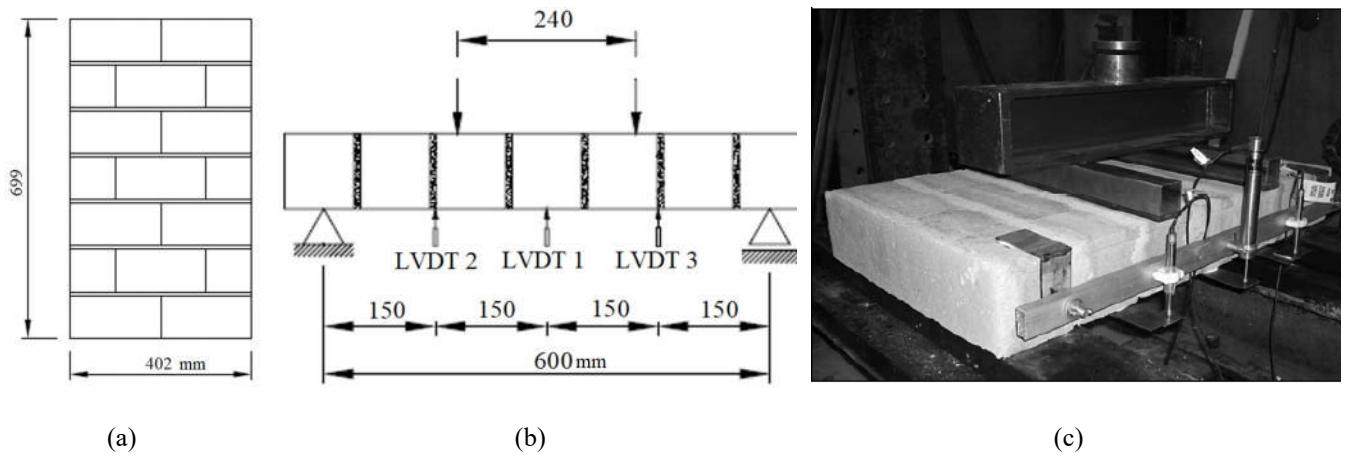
Flexural tests: (a) Specimens dimensions; (b) Instrumentation; (c) Experimental setup [7]
